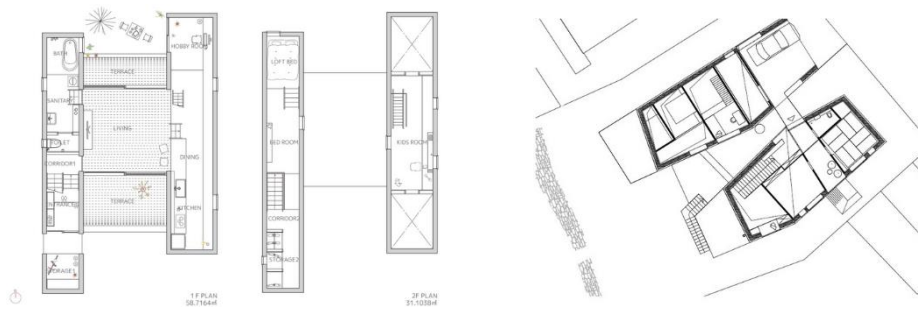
Mascara House / mA-style architects (<http://www.archdaily.com/289248/mascara-house-ma-style-architects/>); Fig. 316 - House 2y / Destilat (<http://www.archdaily.com/291243/house-2y-destilat/>).
